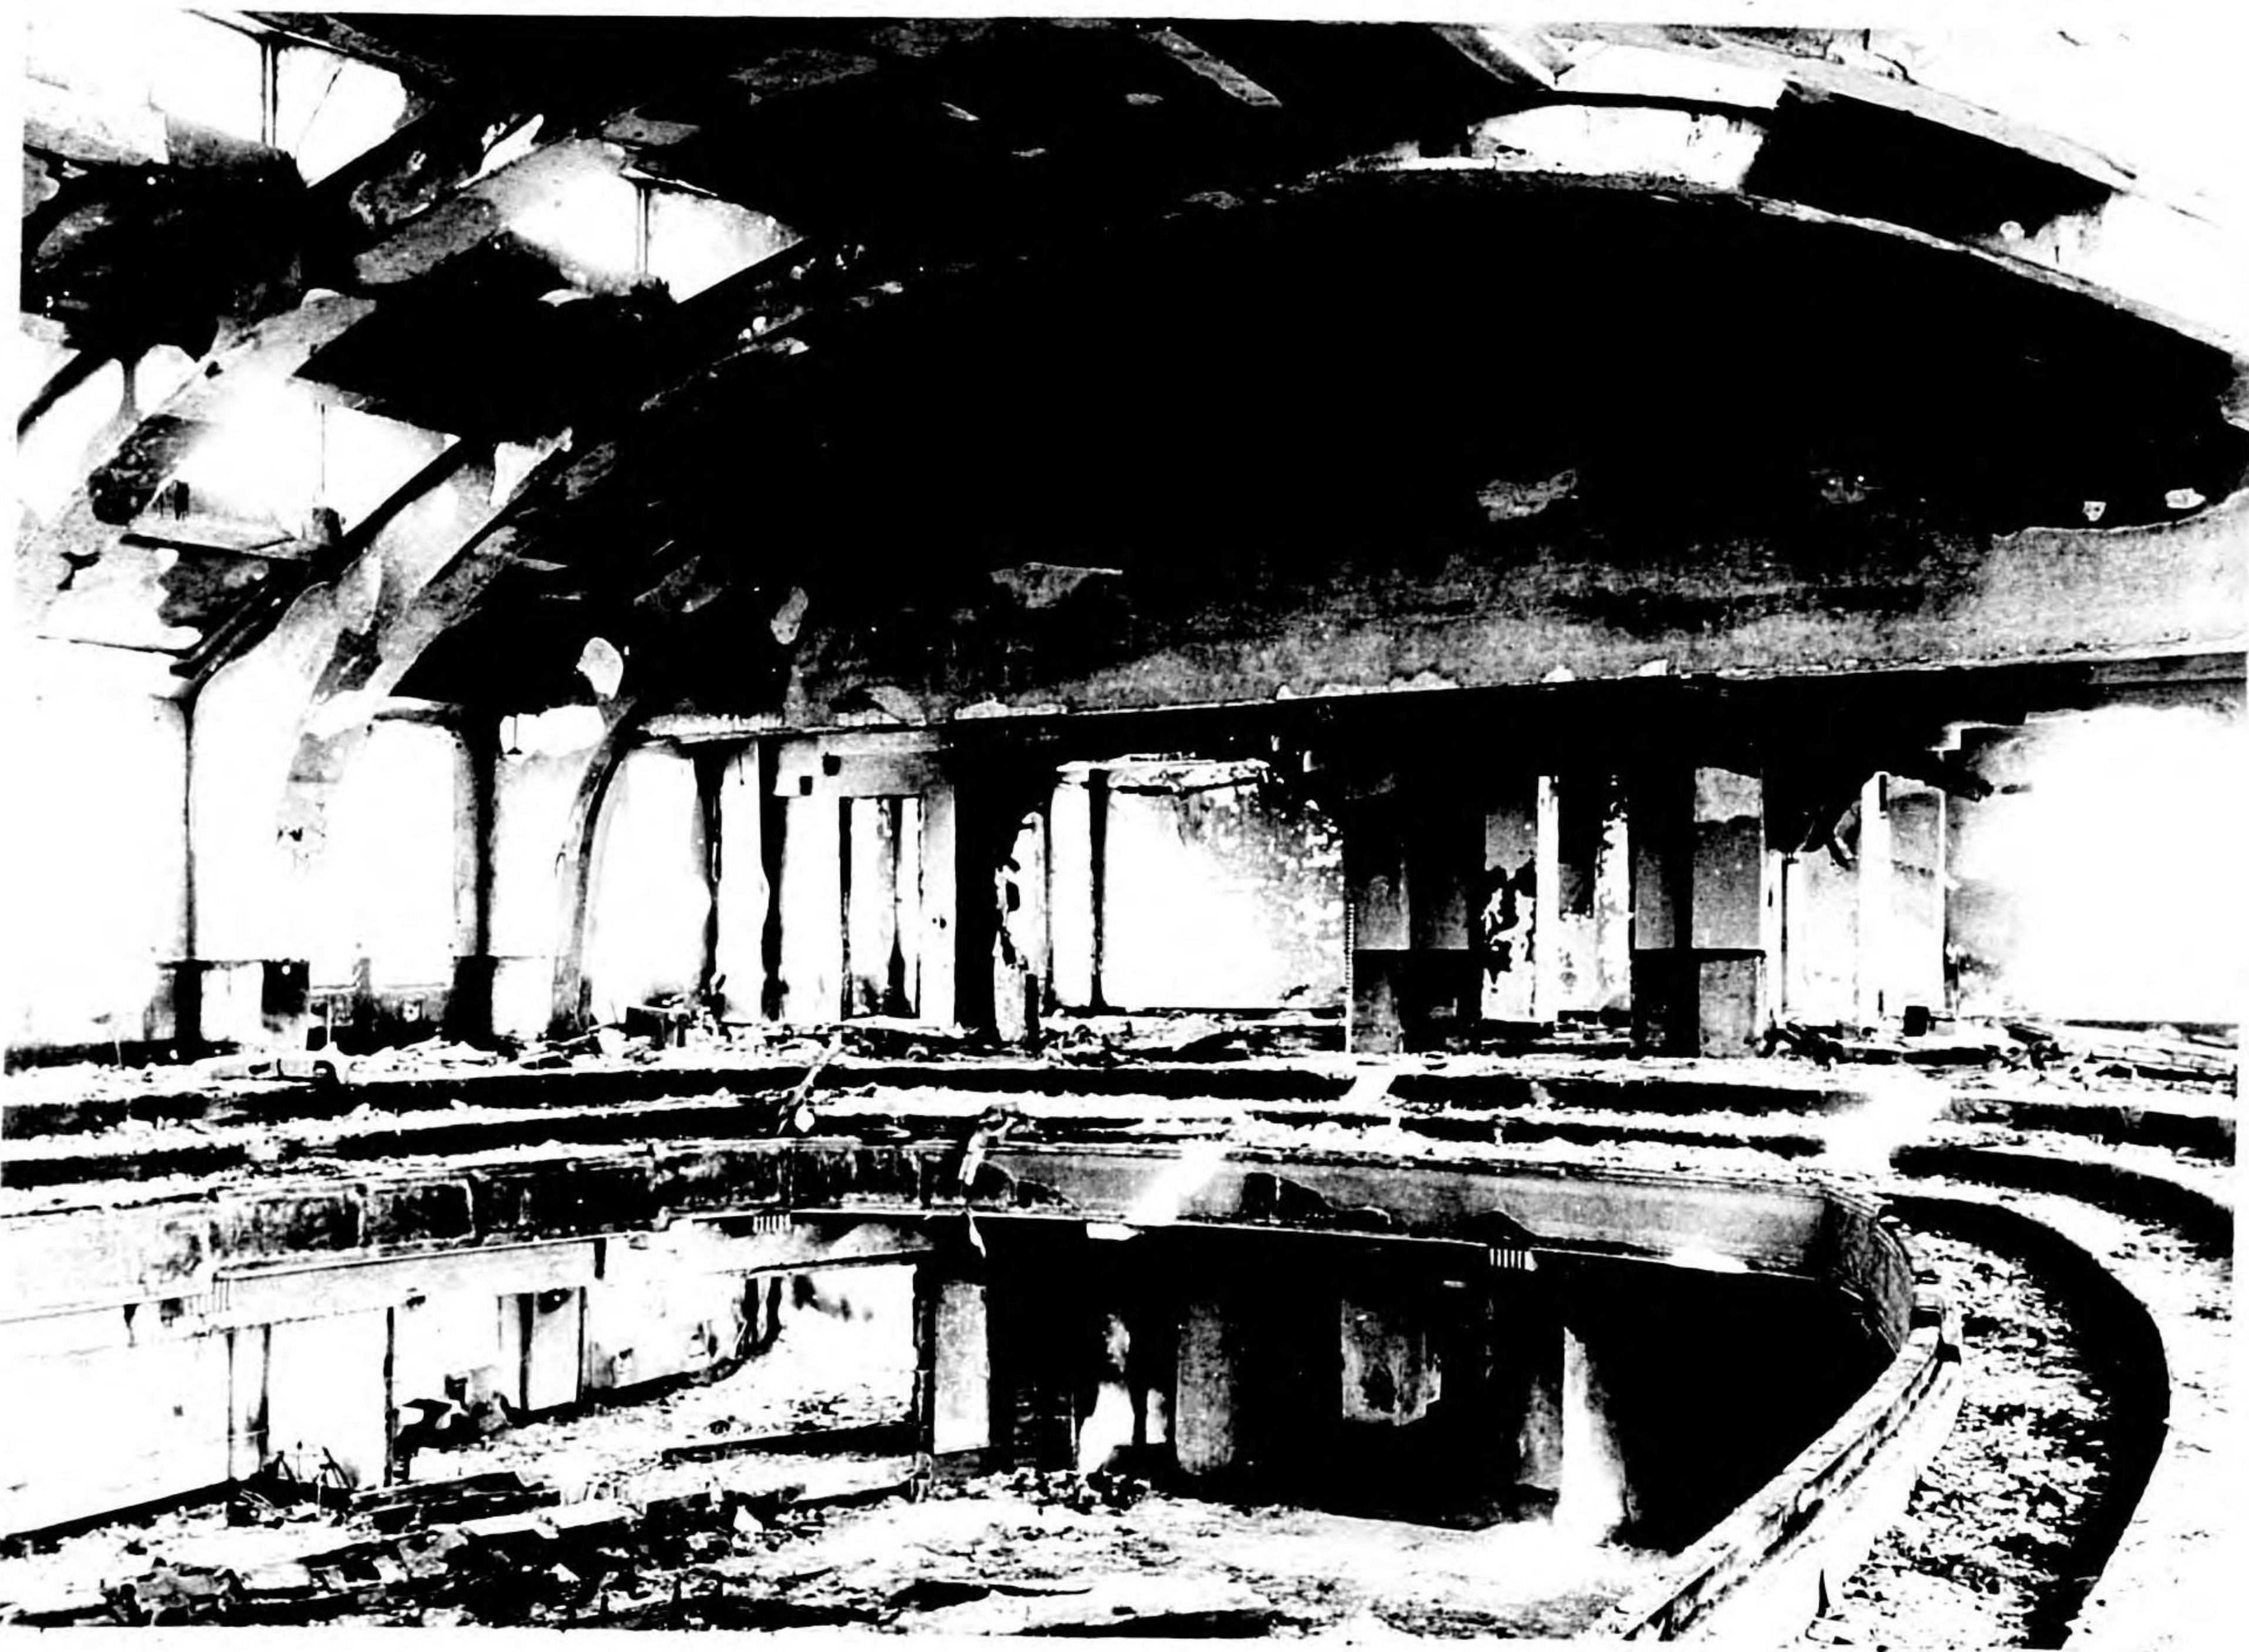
Interior of Photo 188, showing spalling of plaster and total damage to contents by fire, but little damage to framing and walls.
